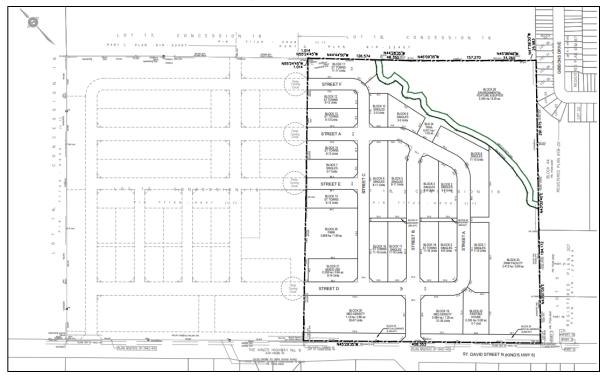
Proposed Draft Plan of Subdivision for Southern Lands (Source: Polocorp Inc.)
